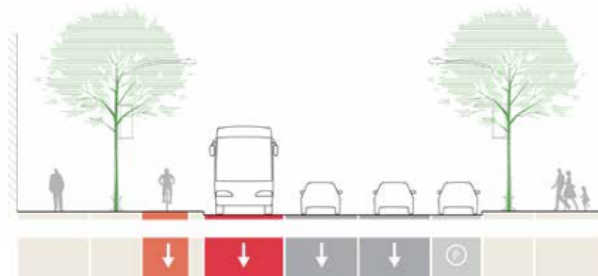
Fifth Street typical section Bowie Street to Guadalupe Street
